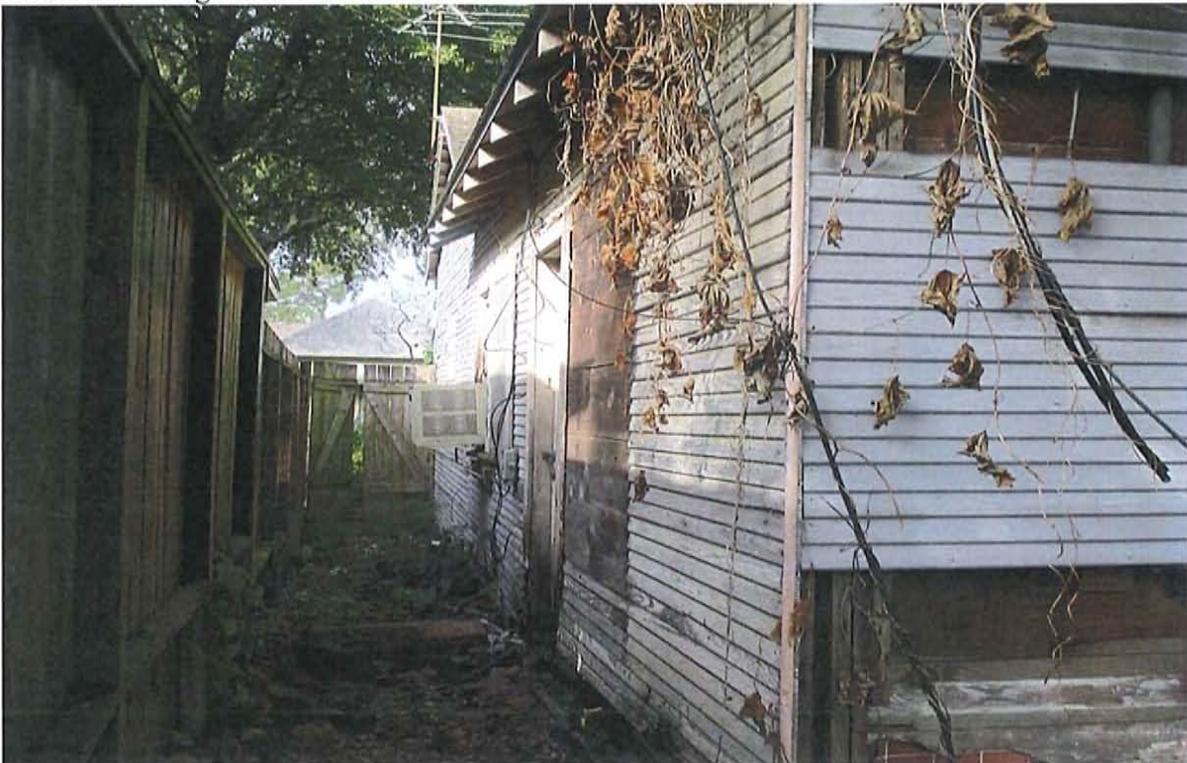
Wood support beam missing/floor supports system deteriorated/destroyed by insects
